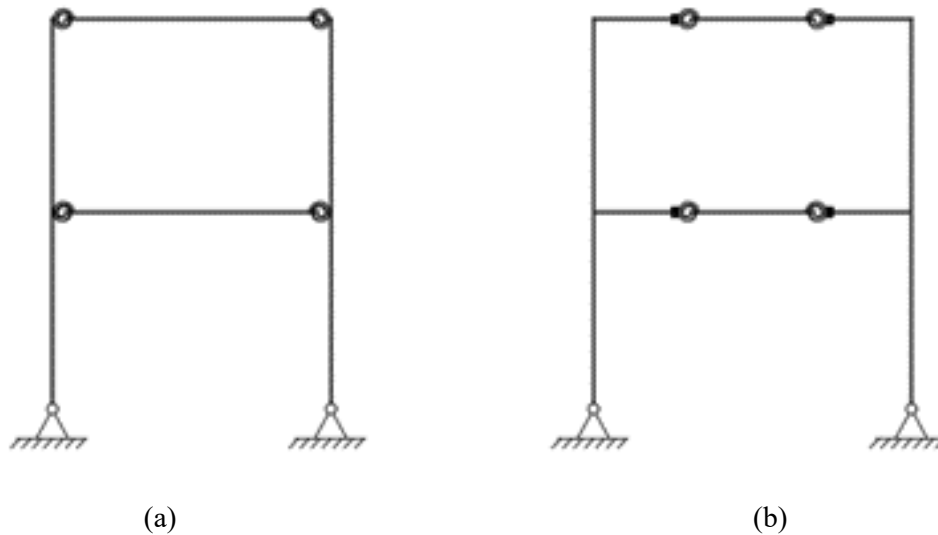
Two semi-rigid connection layout configurations. (a) Traditional configuration. (b) Non-traditional configuration.
